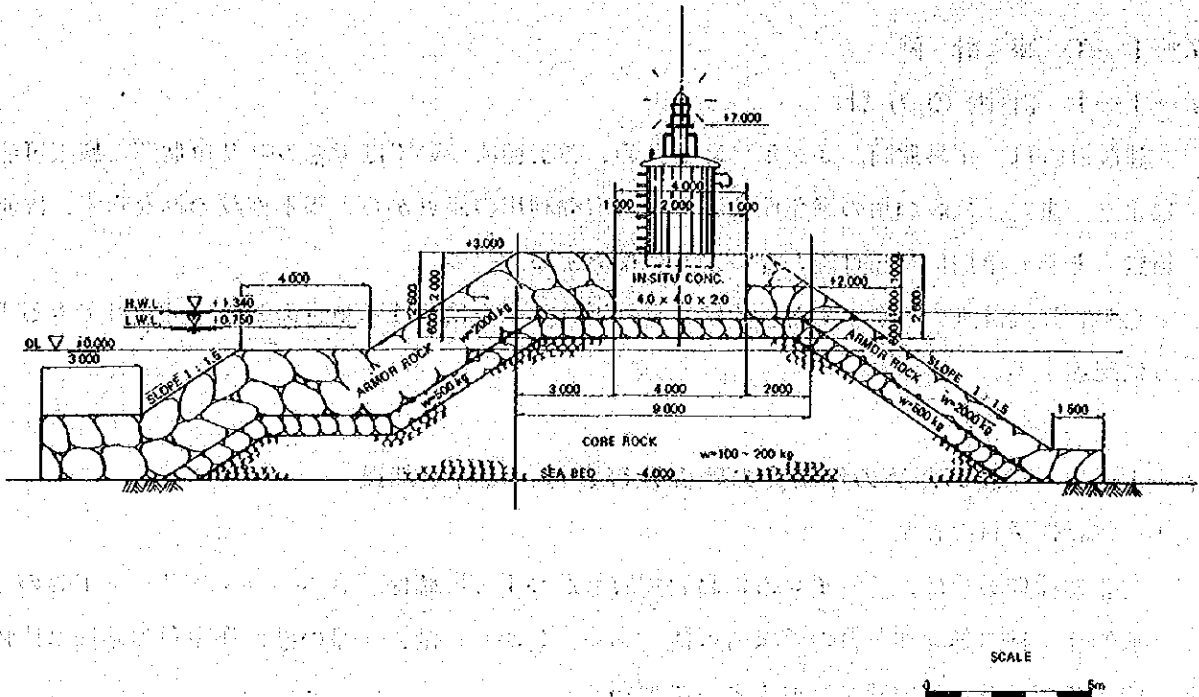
Cross Section of Breakwater (3) - Iloilo Port
